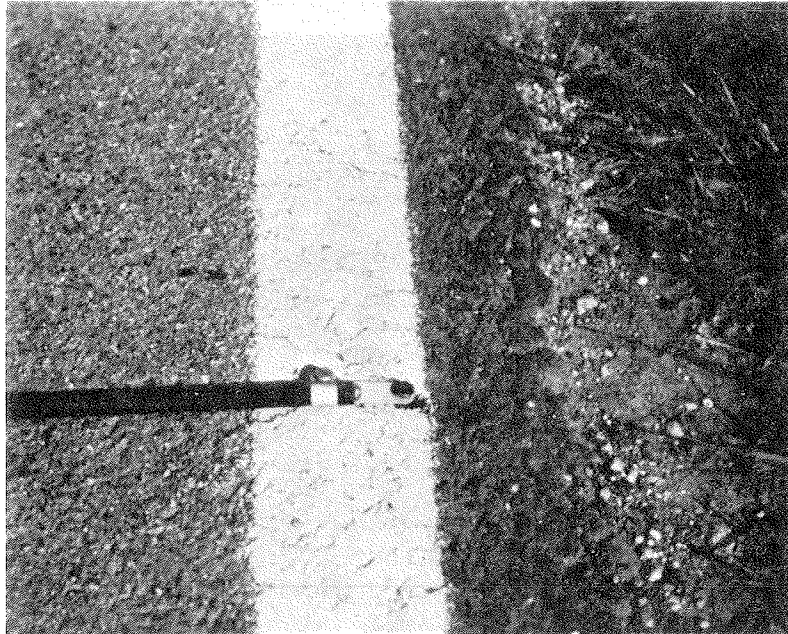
Detail View Showing Hose Clamp and Roadtube Anchored With a Spike Nail at Far-side of Pavement.
